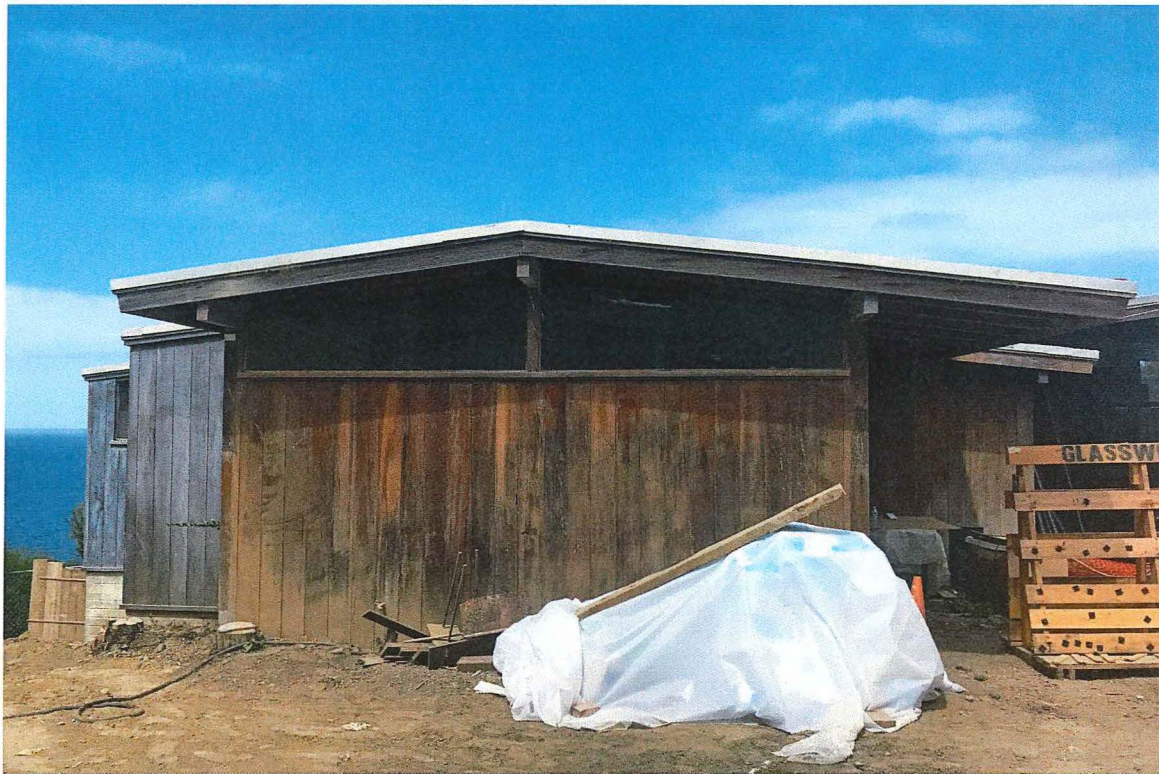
View of the southeast façade of the 1962 addition with a gable-style roof.
